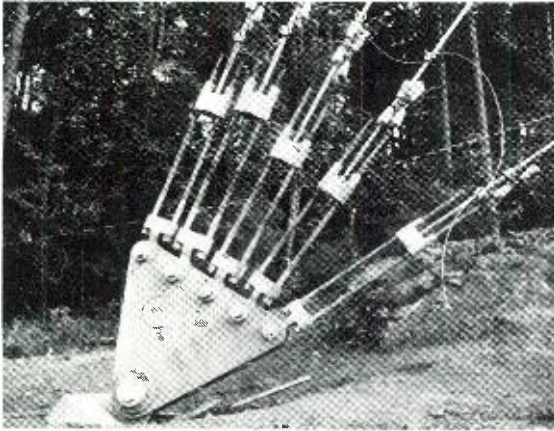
Typical anchor connection with dampers to prevent aeolian vibrations.
